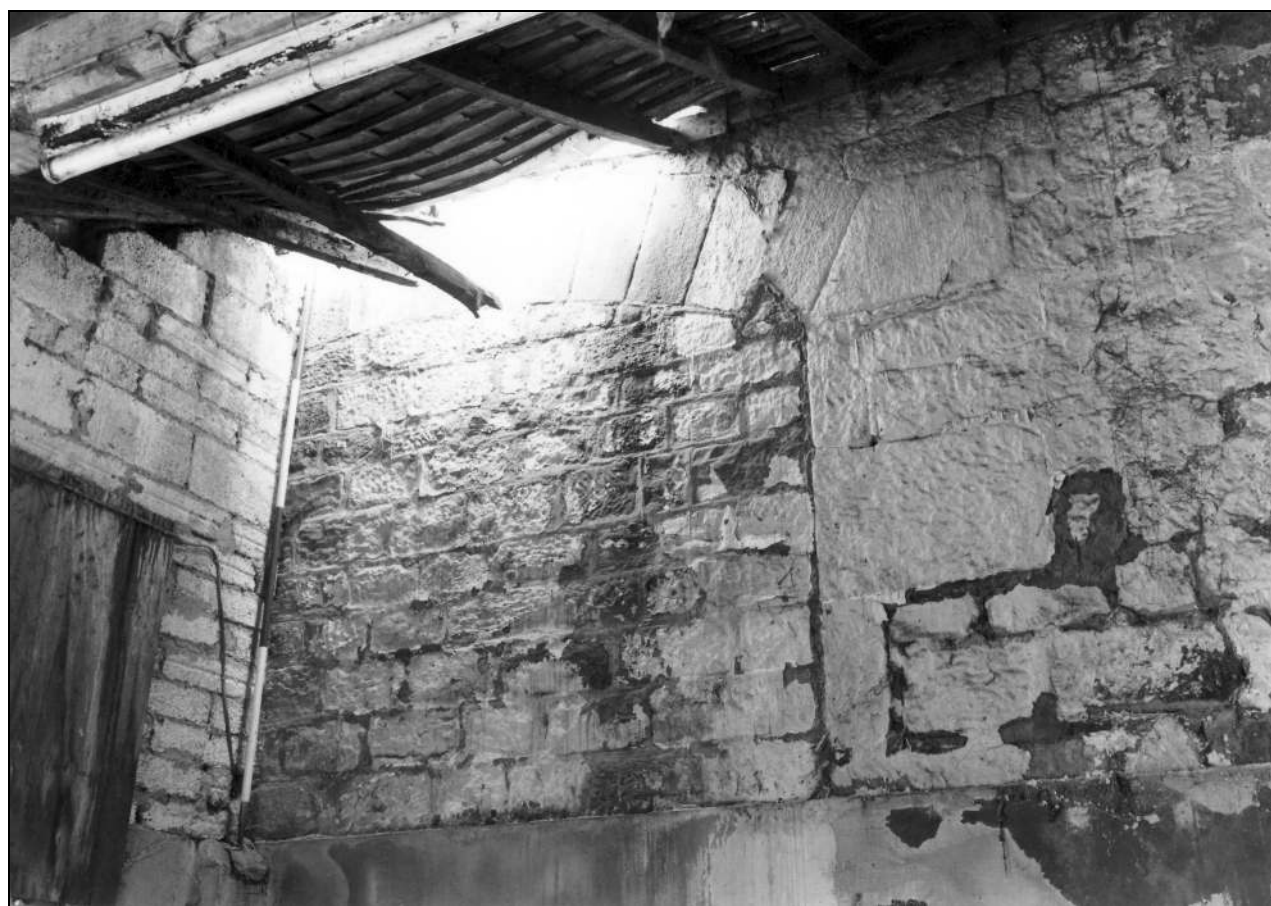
Barn: blocked cart doorway within modern lean-to, east elevation (film 3, frame 3)
